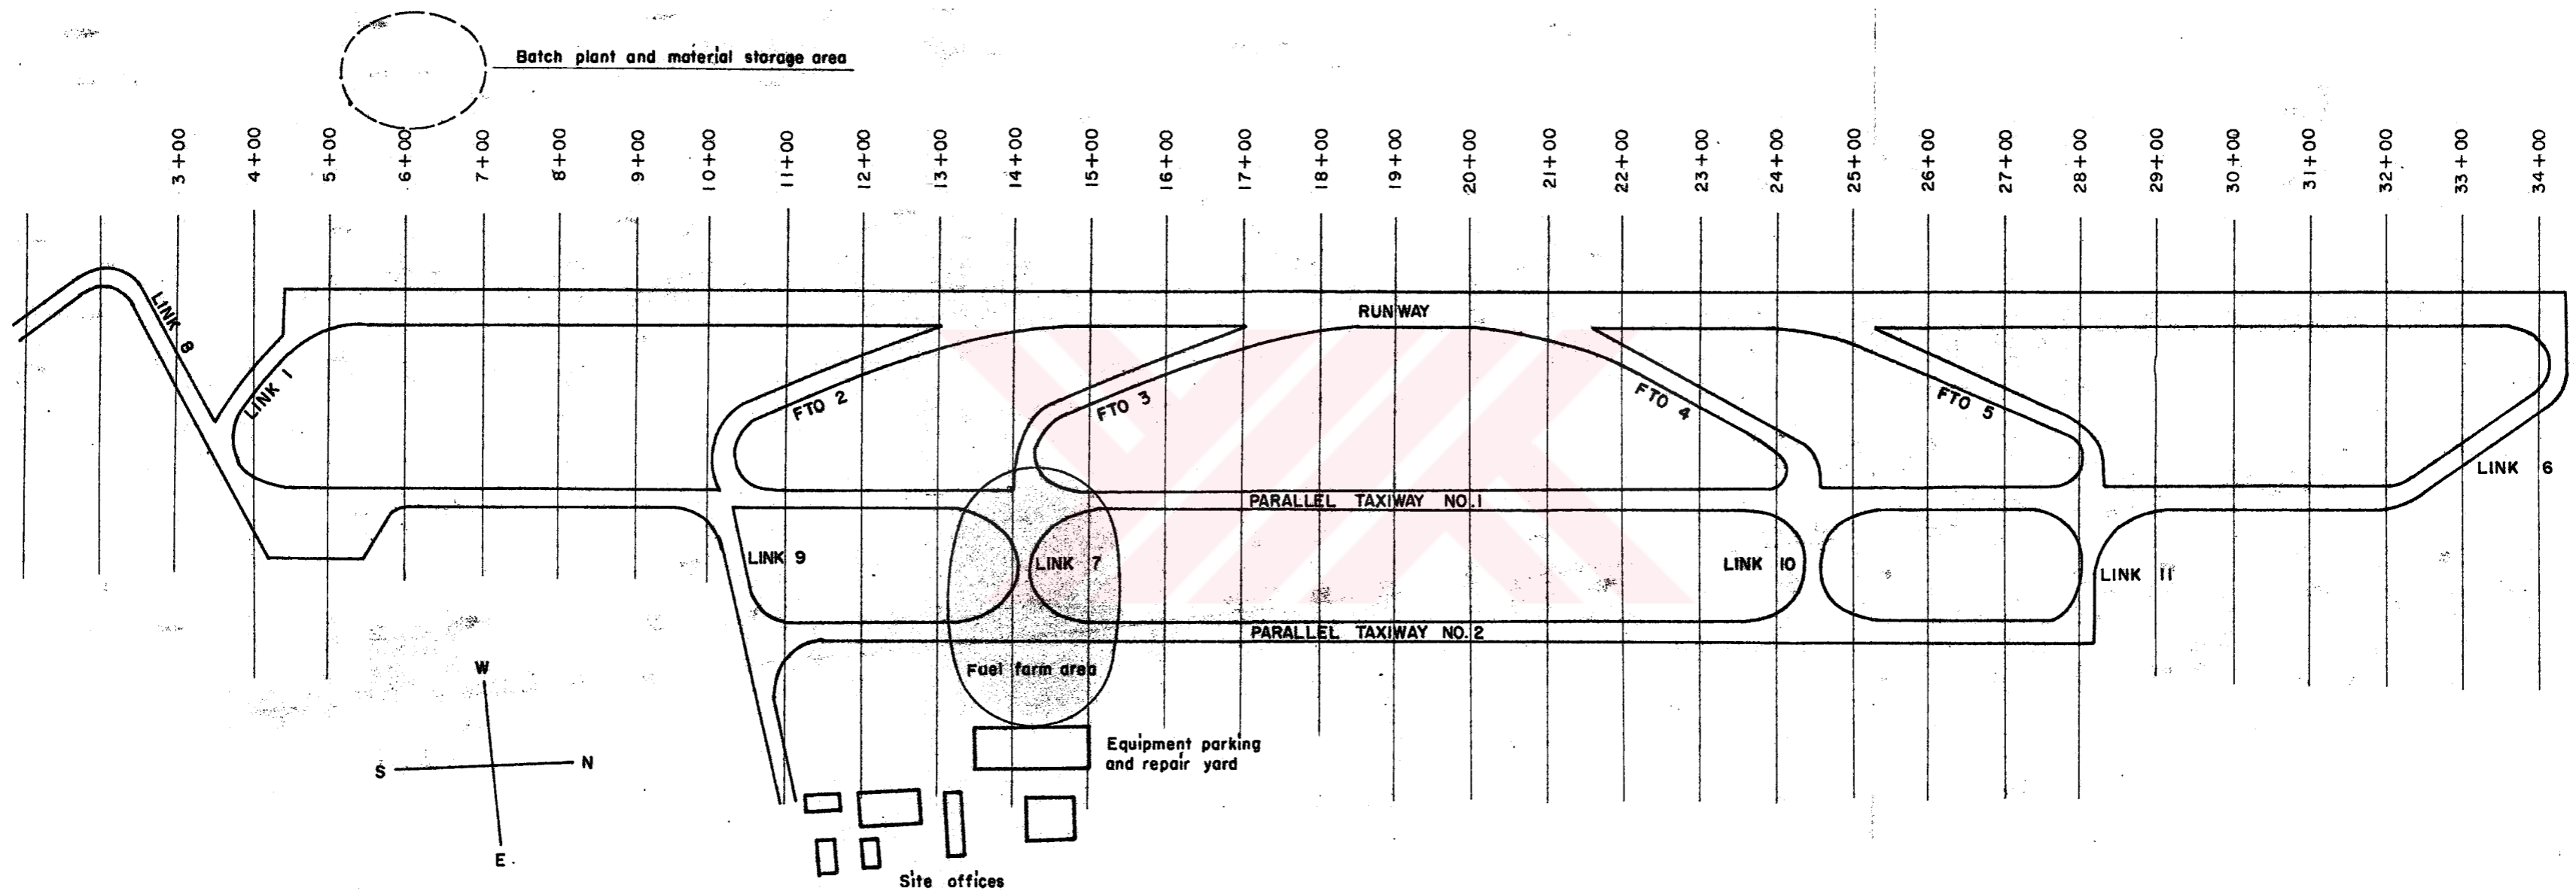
YEŞILKÖY AIRFIELD INFRASTRUCTURE CONSTRUCTION SITE LAYOUT
